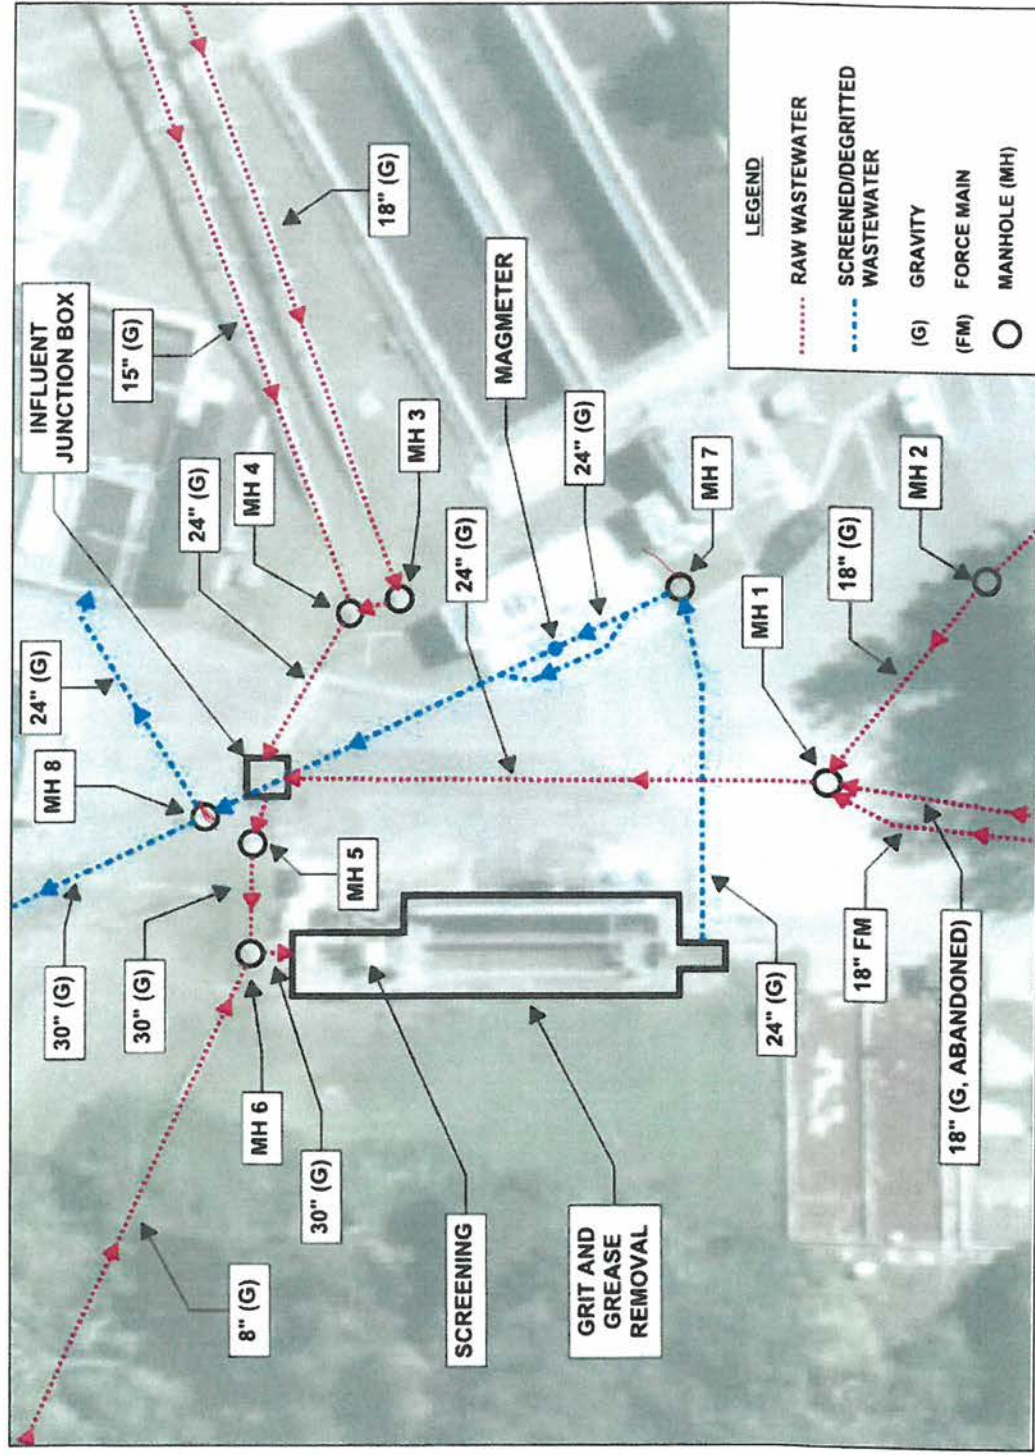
Existing Headworks and Conveyance Piping Layout
